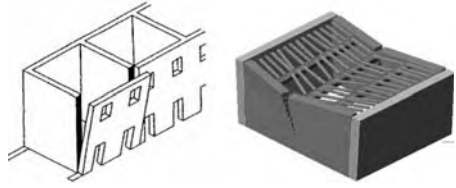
Collapse modes of masonry walls: overturning (left) and horizontal flexure (right).
